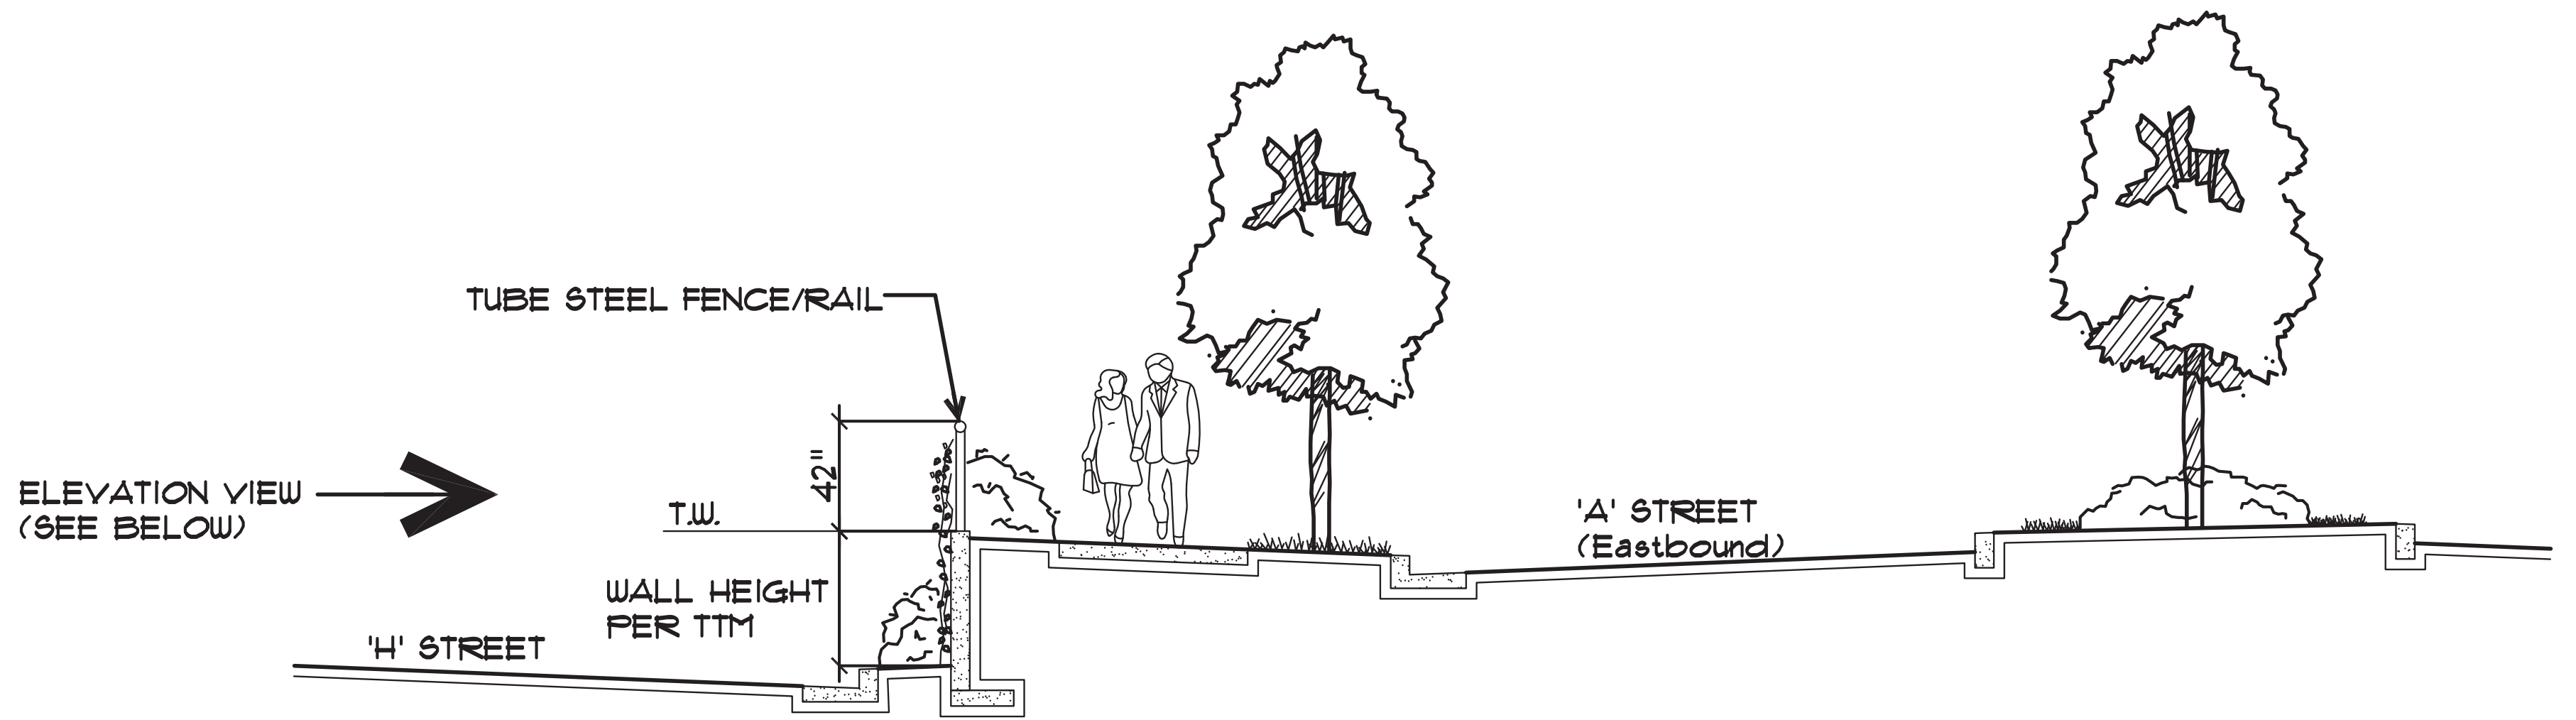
conceptually illustrates this low retaining wall south of "A" Street. As shown, it is proposed that an open 42-inch-high guard rail/fence be installed on top of this wall for pedestrian safety. The construction details for this guard rail/fence will be submitted to and approved by City Development Services and/or General Services Department. If required by the City, shrubs and/or vines will be installed to soften the appearance of this guard rail/fence.
